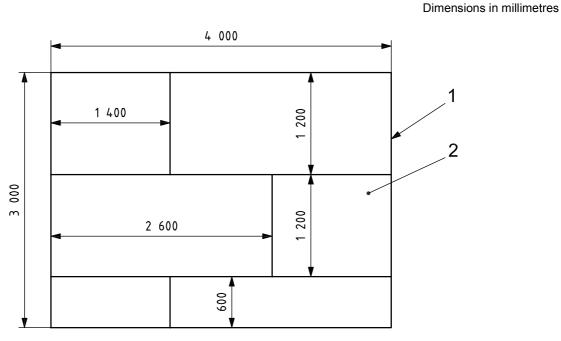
Details of horizontal supporting construction — Layout of support channels
